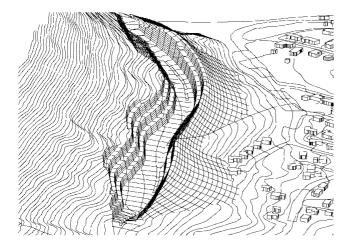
Aerial view of the pit protection. Viewed towards east.
